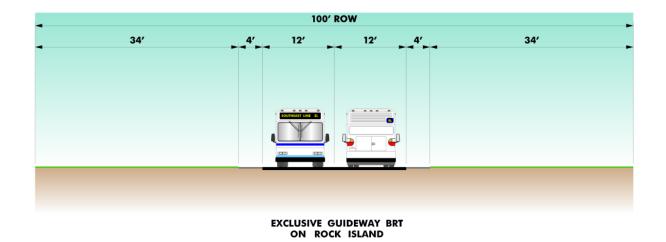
Bus Rapid Transit Rock Island Railroad Typical Section
